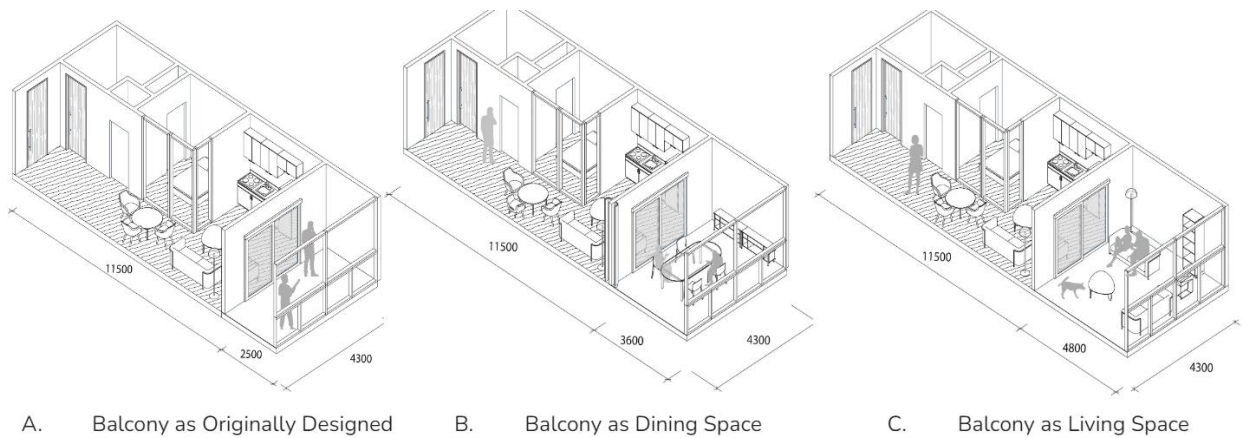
Existing (left) and updated plan (right) when the balcony size is modified to accommodate a living and dining space
